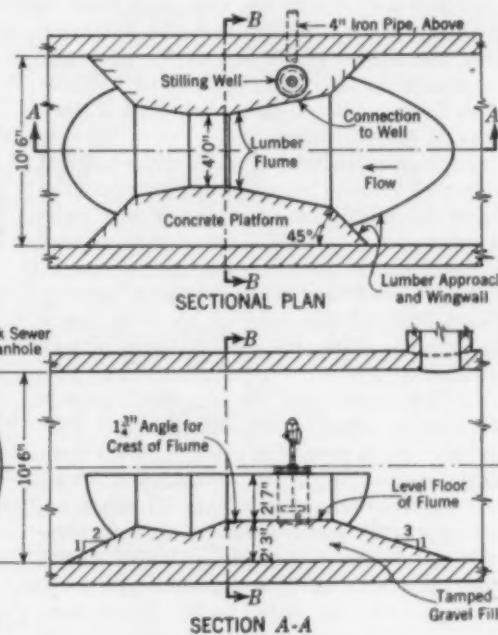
TYPICAL INSTALLATION OF A PARSHALL FLUME AT AN OUTFALL GAGING STATION
